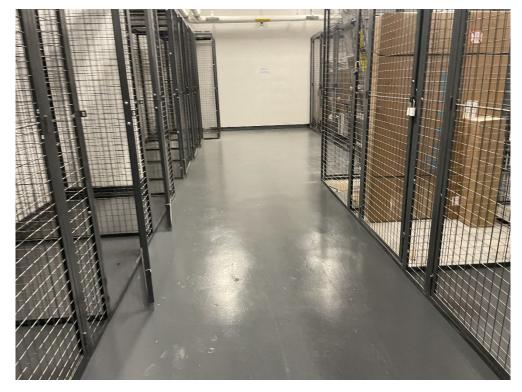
Photo of the concrete slab in the tenant storage room in the Site's cellar.
